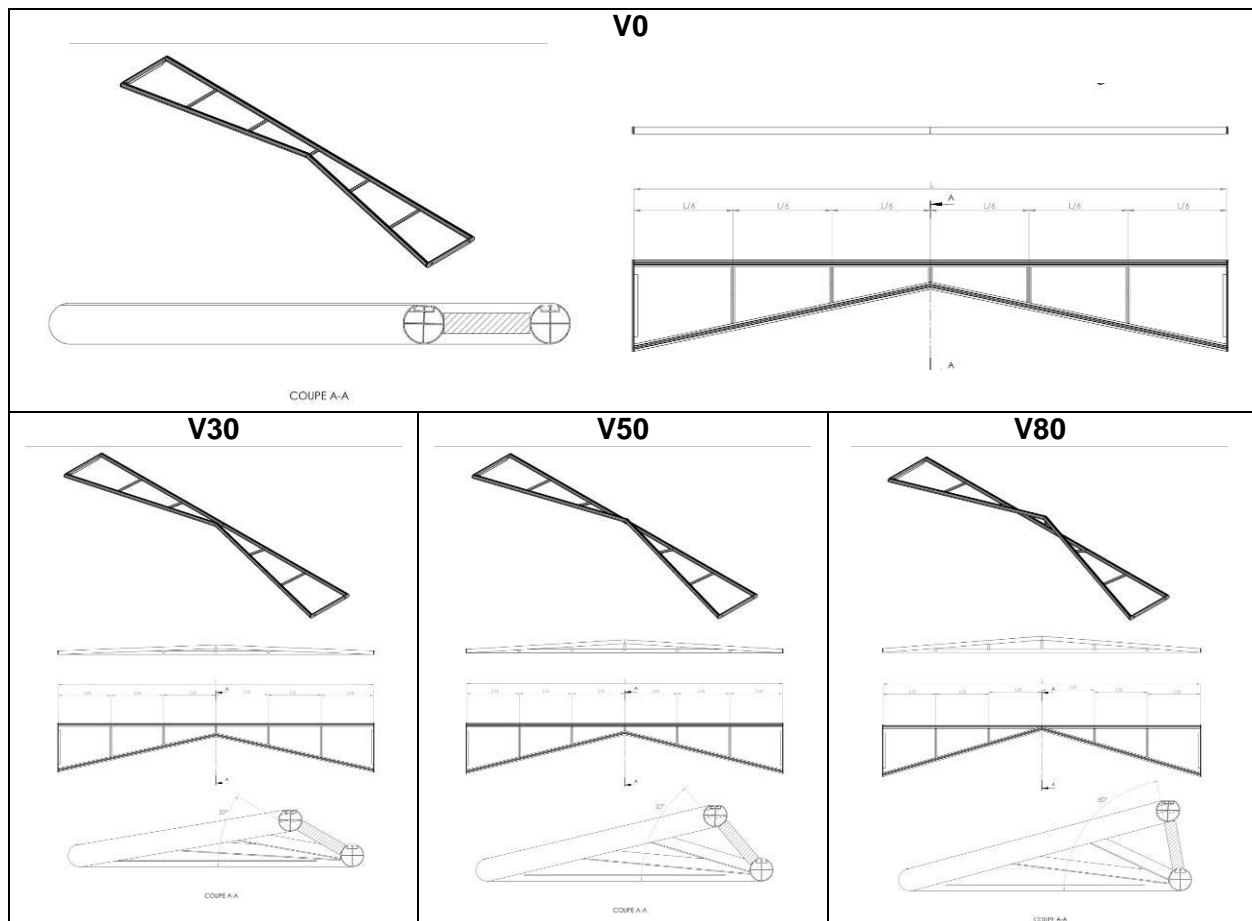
“V0” sail details (upper); “V30” sail details (down left); “V50” sail details (down centre); “V80” sail details (down right).
